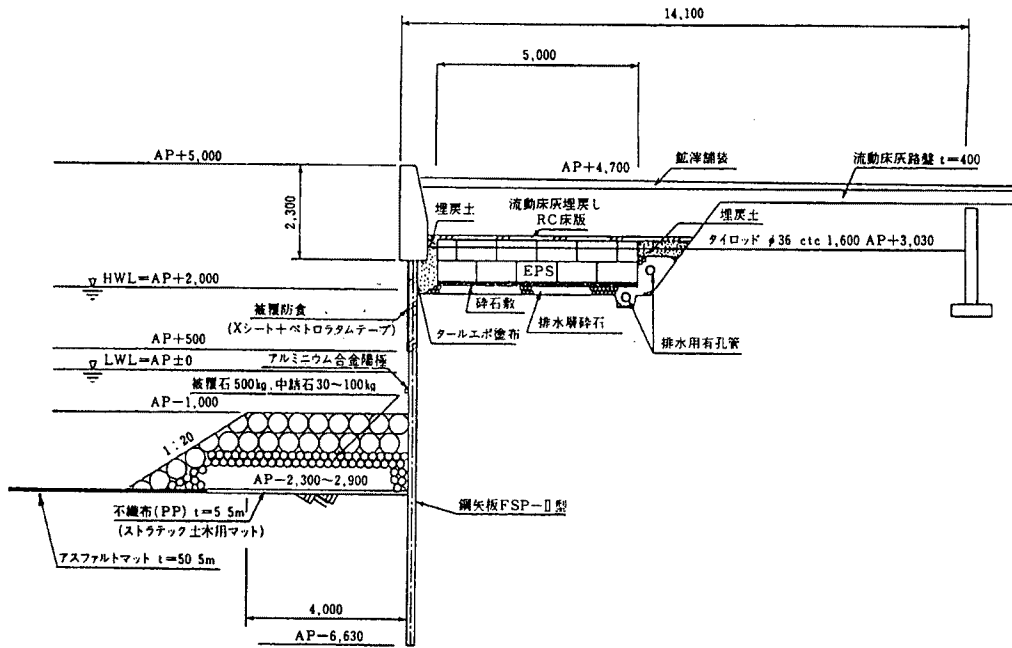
Section of reinforcement work for steel sheet-pile revetment.
